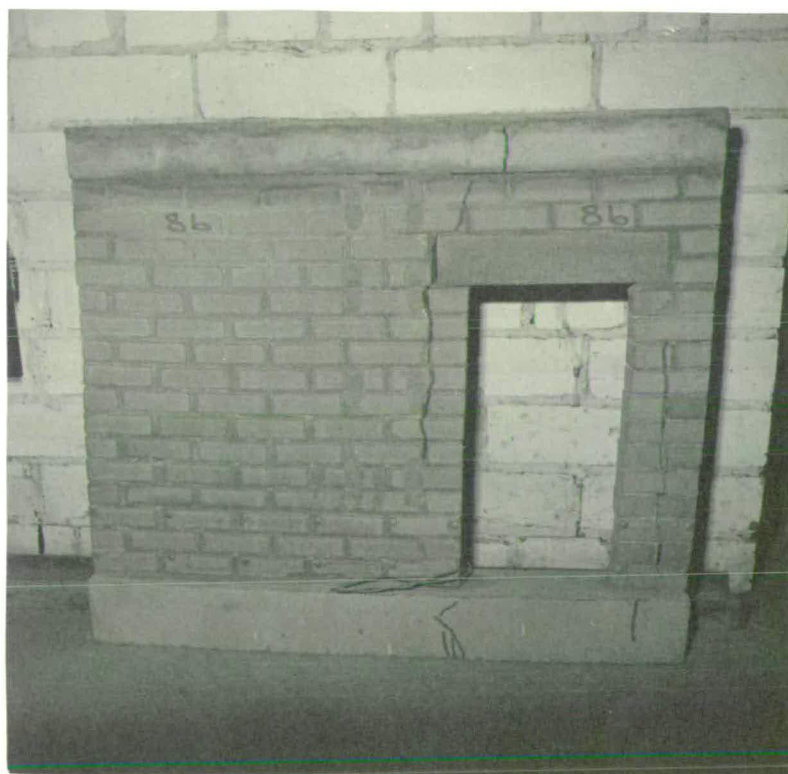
CRACK PATTERN IN WALL 8b AFTER FAILURE
